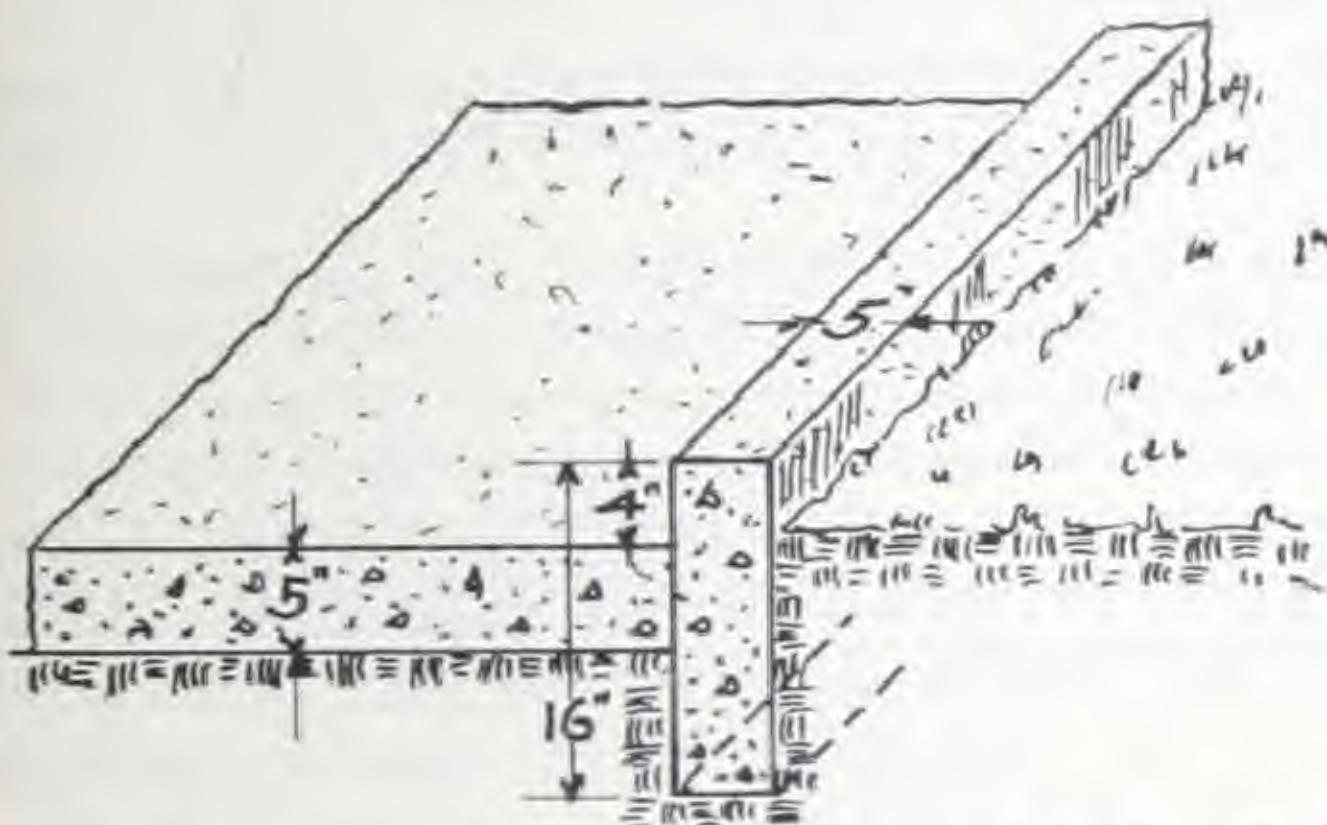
Diagrams showing construction of feeding floor. At the right the apron or turndown wall to prevent hogs from rooting up the floor.
